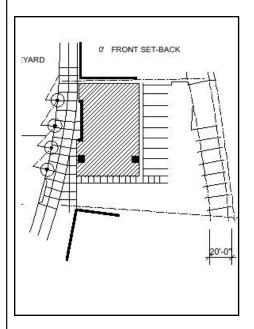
Preferred: Site plan showing the preferred configuration for contextual infill commercial development with a pedestrian-scaled façade on the street and parking behind.
